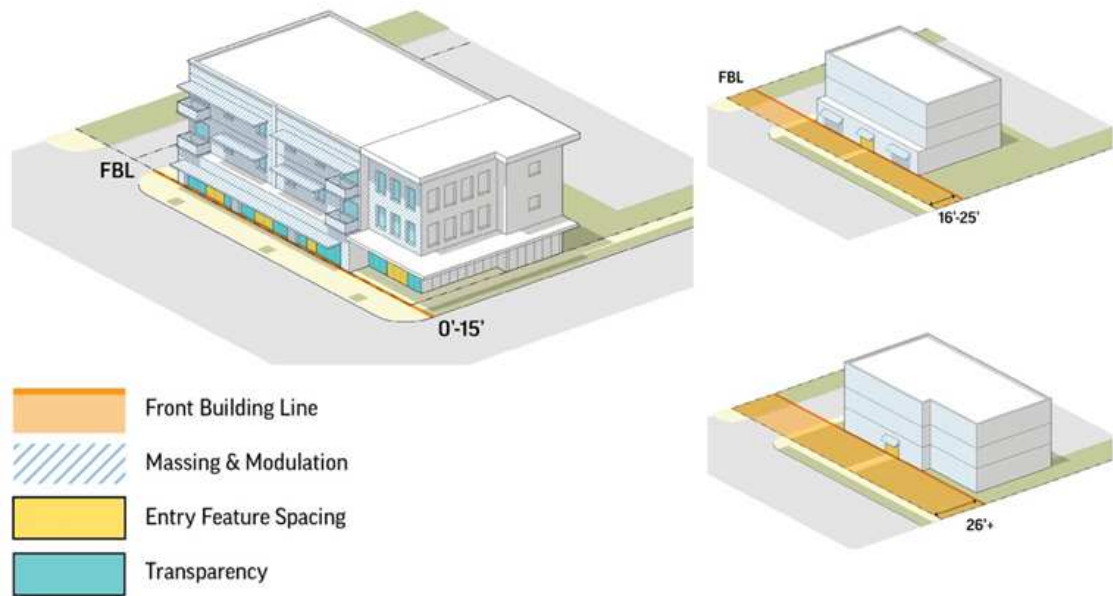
Building design standards, building elements, and administrative adjustments should be applied based on the proximity of buildings to streetscapes and active social spaces around the building.
